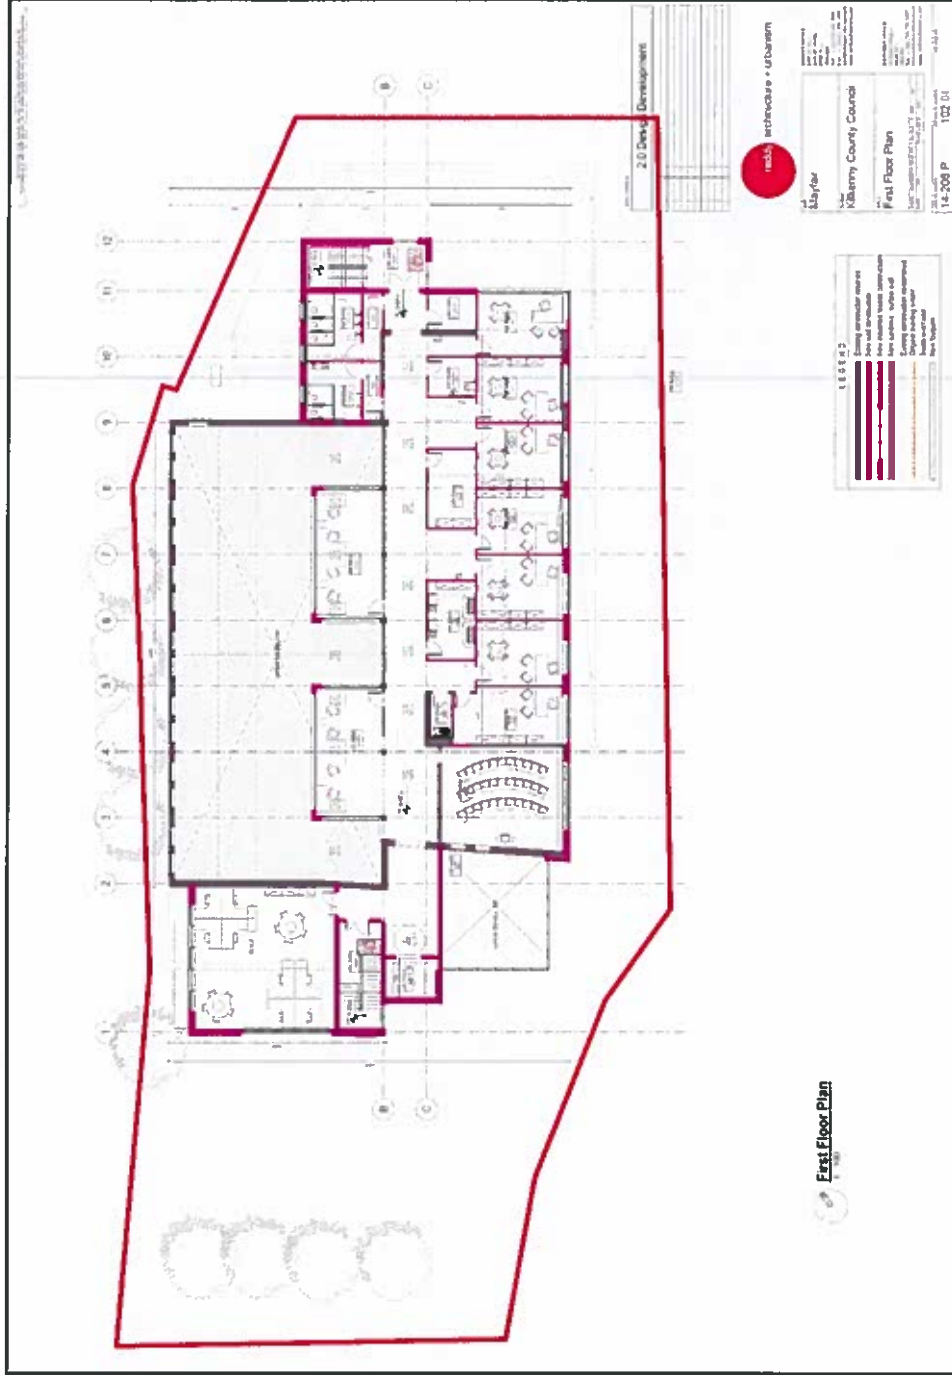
Proposed works on the 1st floor level of the Mayfair building.
